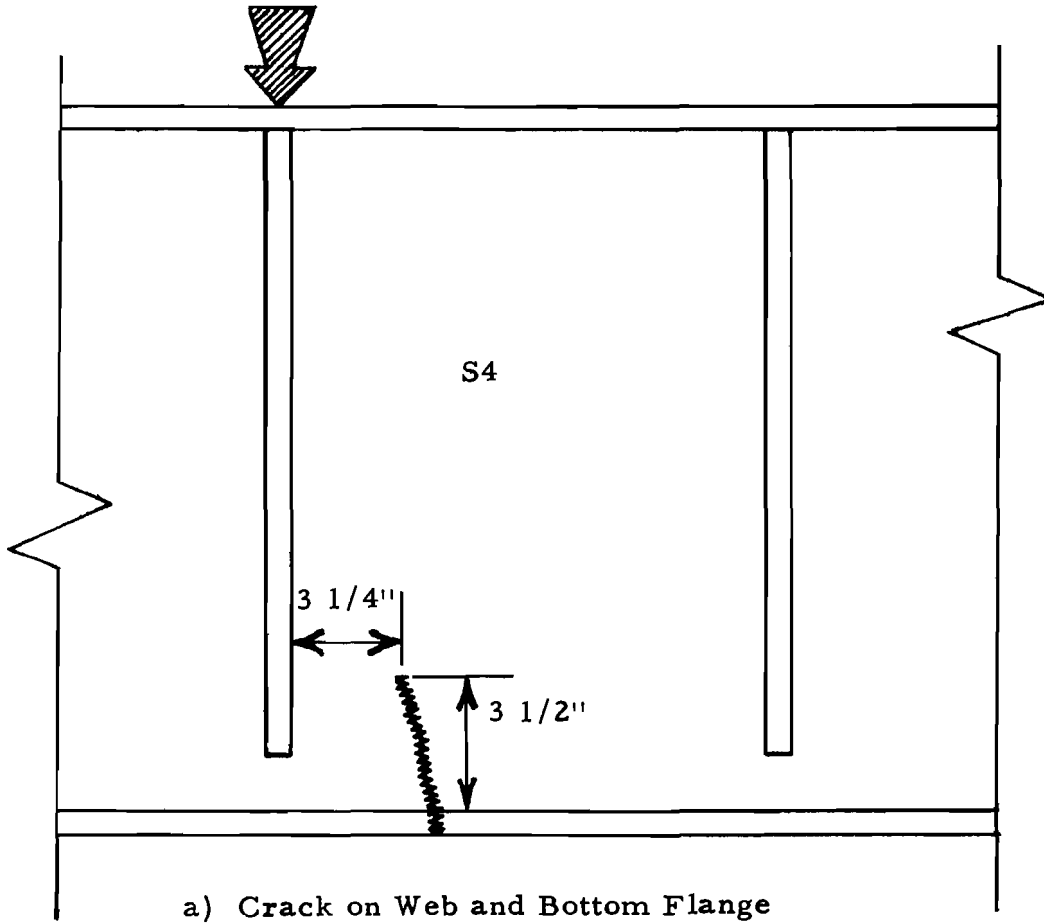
TYPE 3 CRACK IN GIRDER 32550 F05
